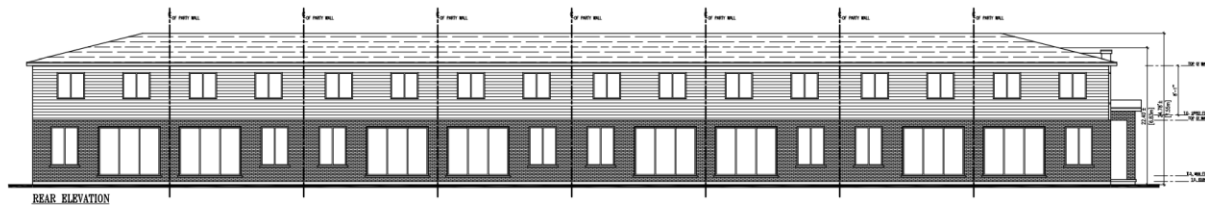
East Elevation (facing 1171 Dobie Street)
